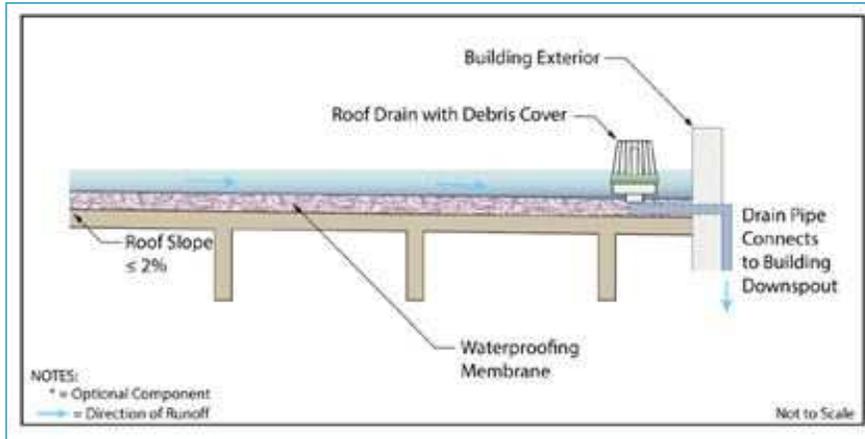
Profile section of a controlled flow roof drain system with a slope less than or equal to 2% (Source: NJDEP 2017)
